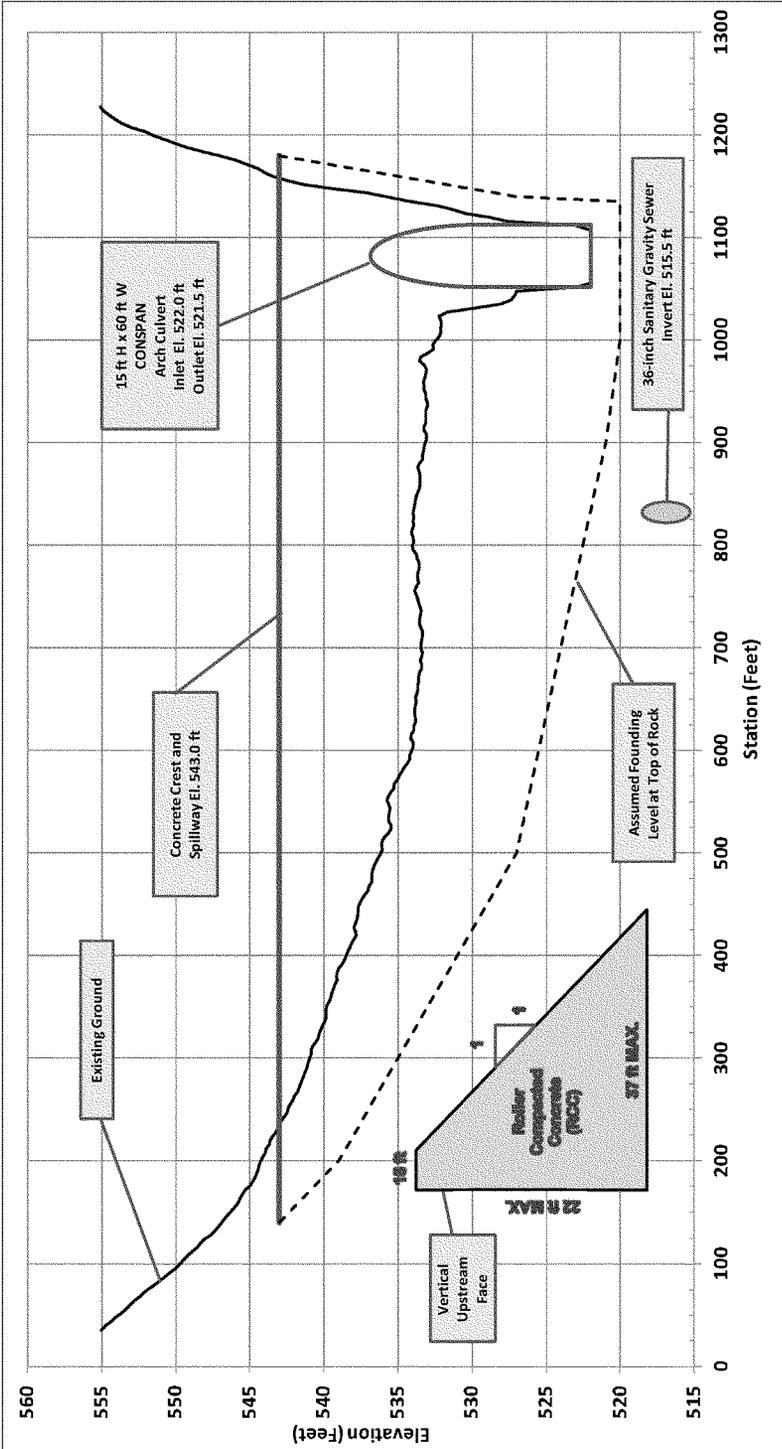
RCC Structure River Mile 18.0 – Typical Cross Section Looking Downstream
